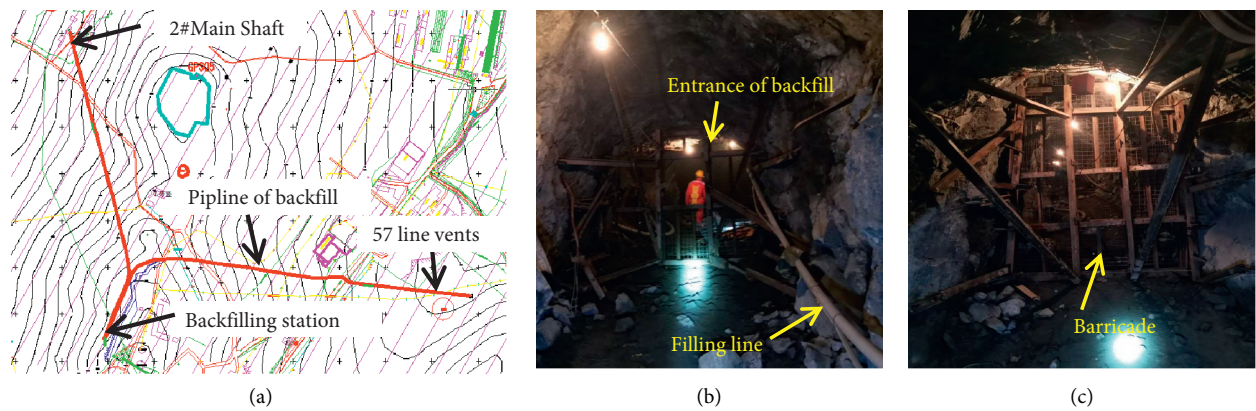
Industrial test. (a) The layout of backfilling pipeline at surface; (b) entrance of backfill at a goaf; (c) construction of barricades.
